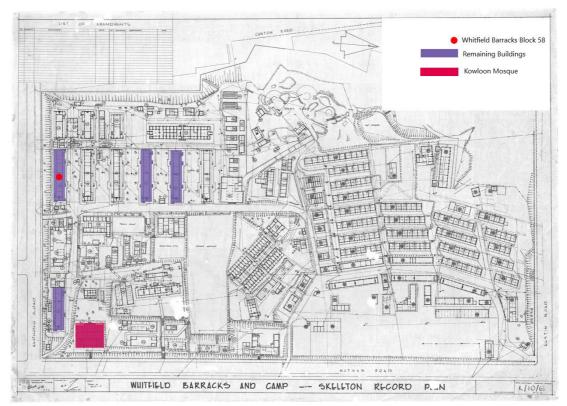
The remaining buildings nowadays, based on the layout shown in Whitfield Barracks and Camp, Skeleton Record, 18 May 1961, Drawing No. K/10/61. (Source: Public Records Office, File No. HKRS913-1-122 with the Author's edition)
